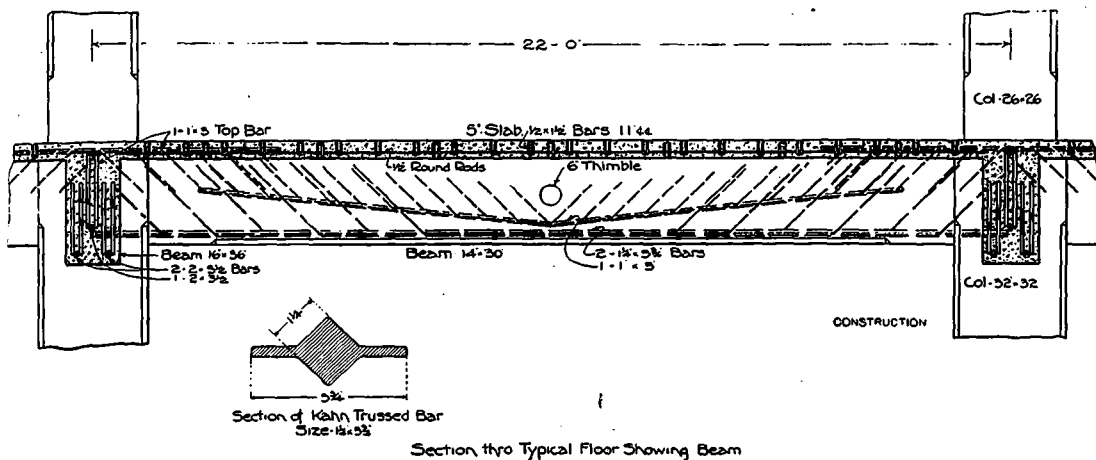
SECTIONAL DIAGRAM OF TYPICAL BEAM, ANDREW DARLING BUILDING, TORONTO, SHOWING ARRANGEMENT OF REINFORCING STEEL, WHICH CONSISTS OF TWO $1\frac{1}{4}$ IN. X $3\frac{3}{4}$ IN. KAHN BARS, HAVING SHEAR DIAGONALS 30 IN. IN LENGTH, AND ONE 1 IN. X 3 IN. KAHN BAR, HAVING SHEAR DIAGONALS 18 IN. IN LENGTH.
